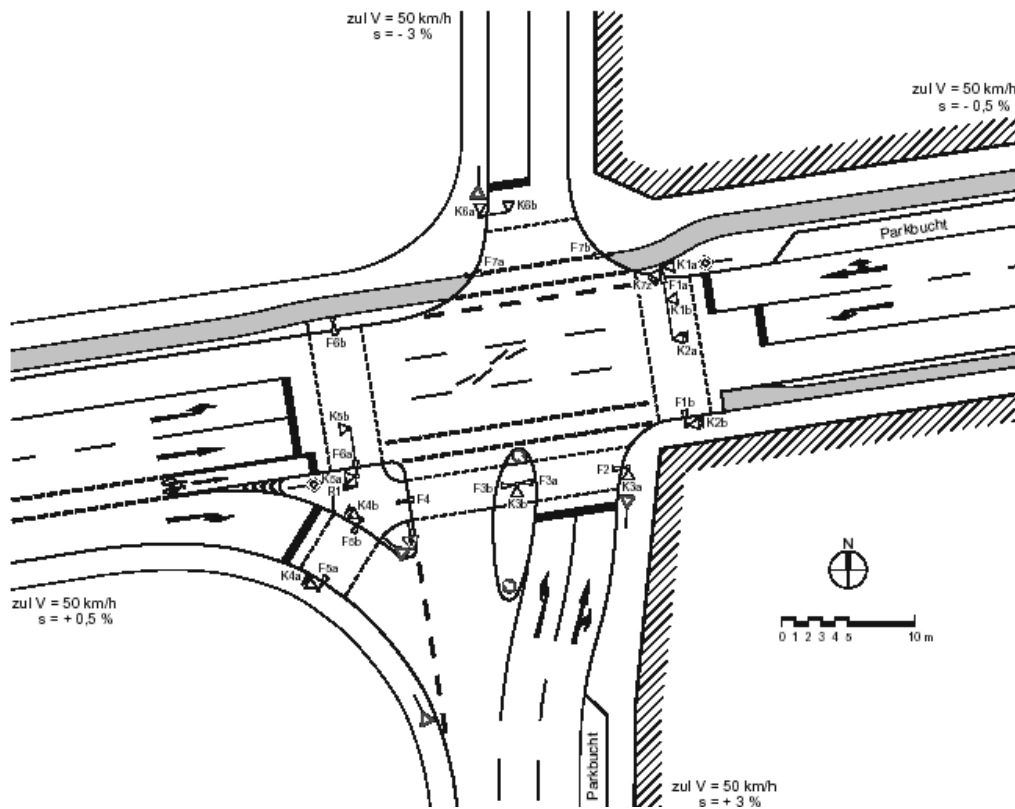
Example of layout design related to crossings (source: RilSA, 2003)
